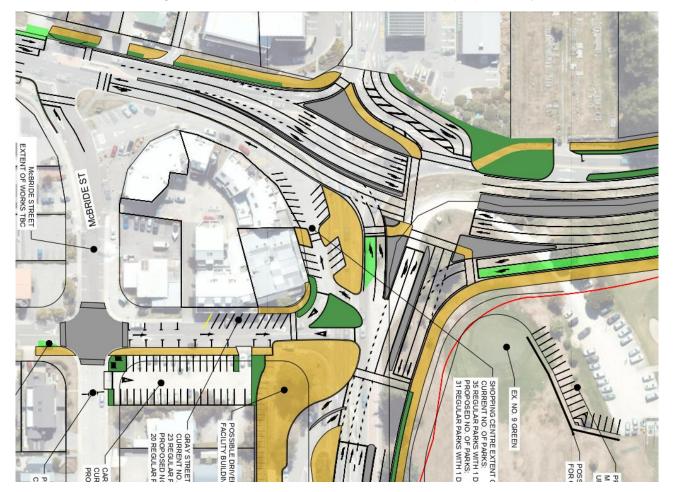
Frankton Shops - proposed access and parking arrangement
